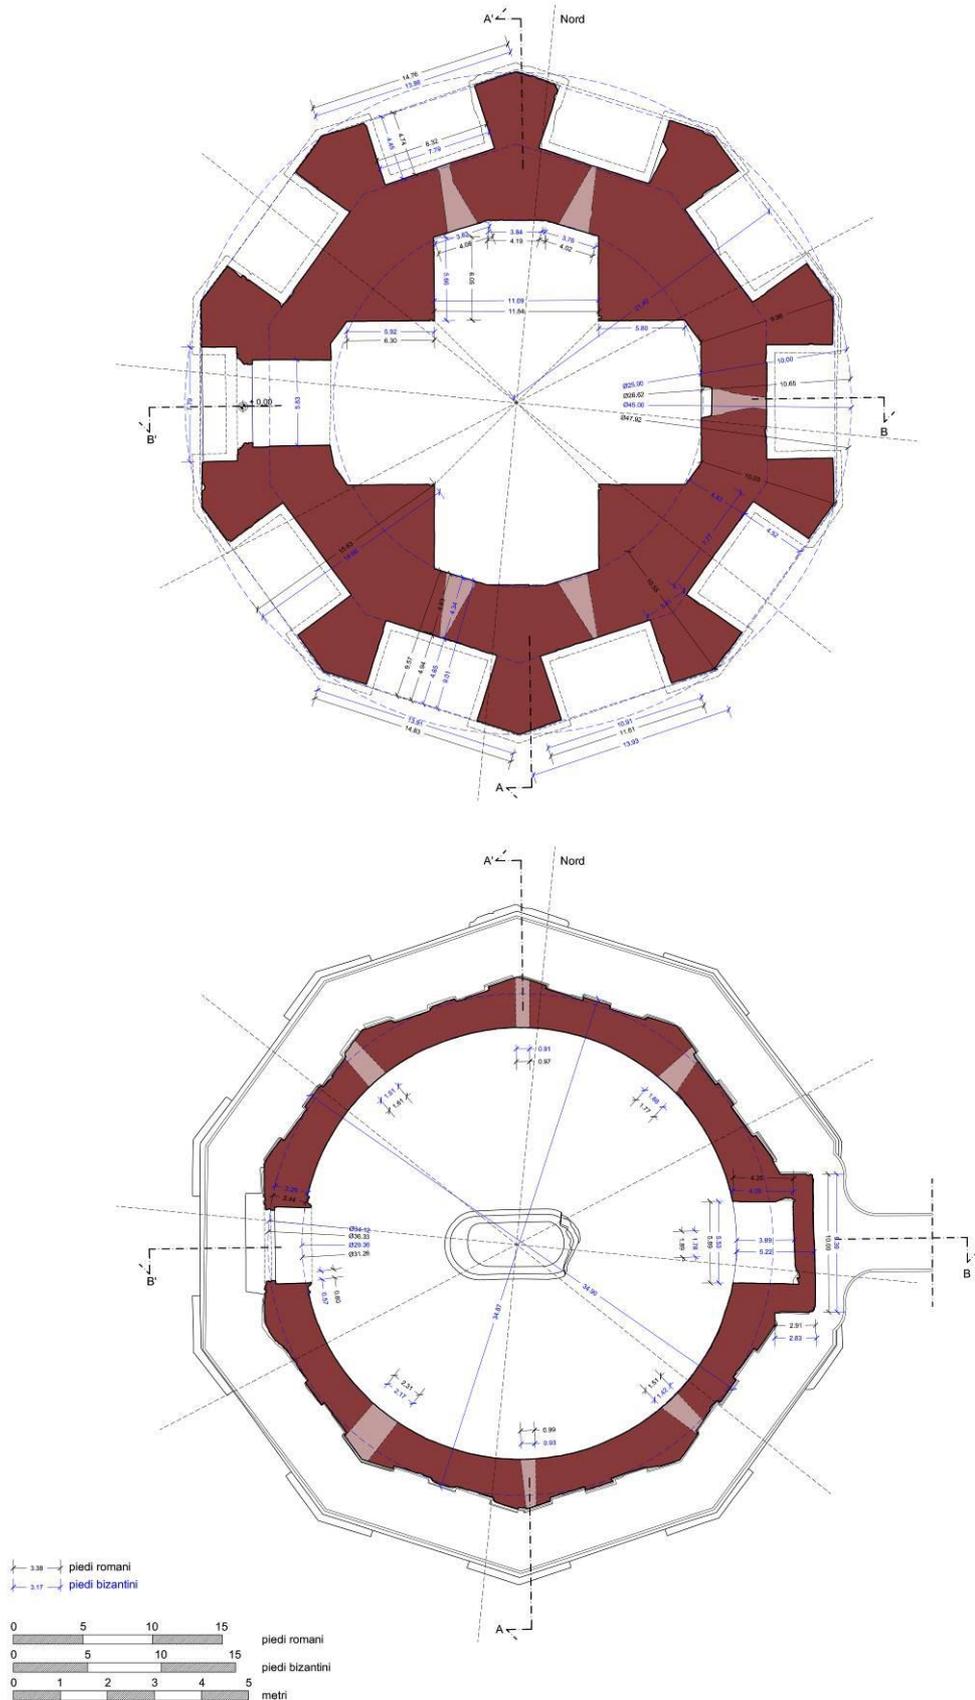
Mausoleum of Theodoric, Ravenna. Plans of the ground floor and first floor. Graphic elaborations of 3d survey.
